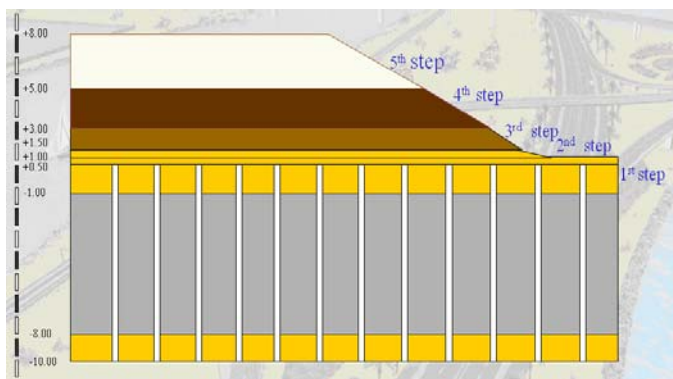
Construction sequences of preloading embankment on improved soil by PVD.
